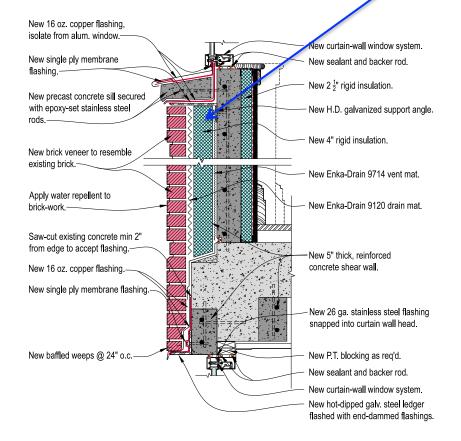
Opt. 2 "Reconstruction" at Brick Walls
